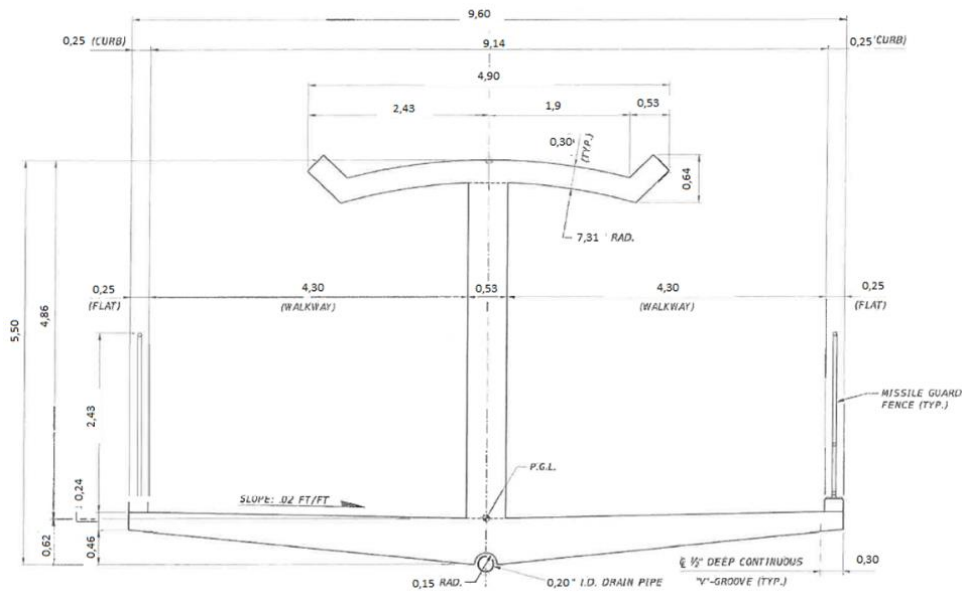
Drawing of the deck cross-section (dimensions in meter) [24].
